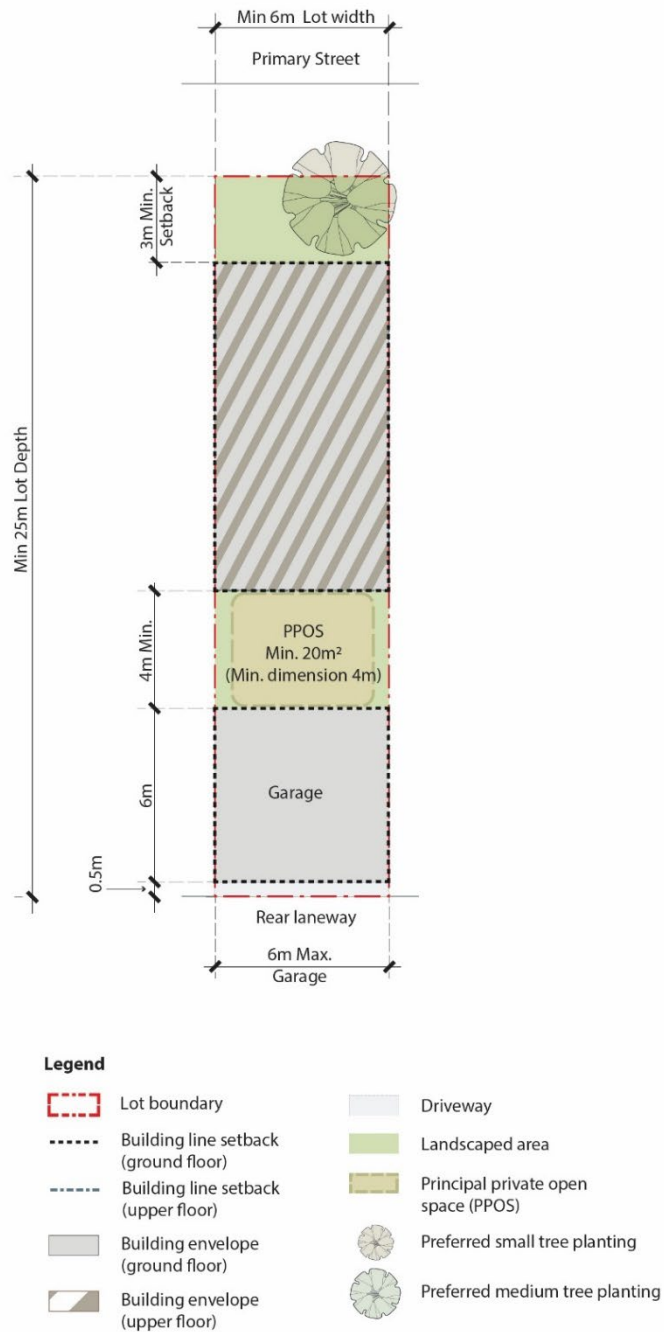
Typical lot layout for a minimum 180m² lot with a zero-lot line (two sides) attached dwelling
